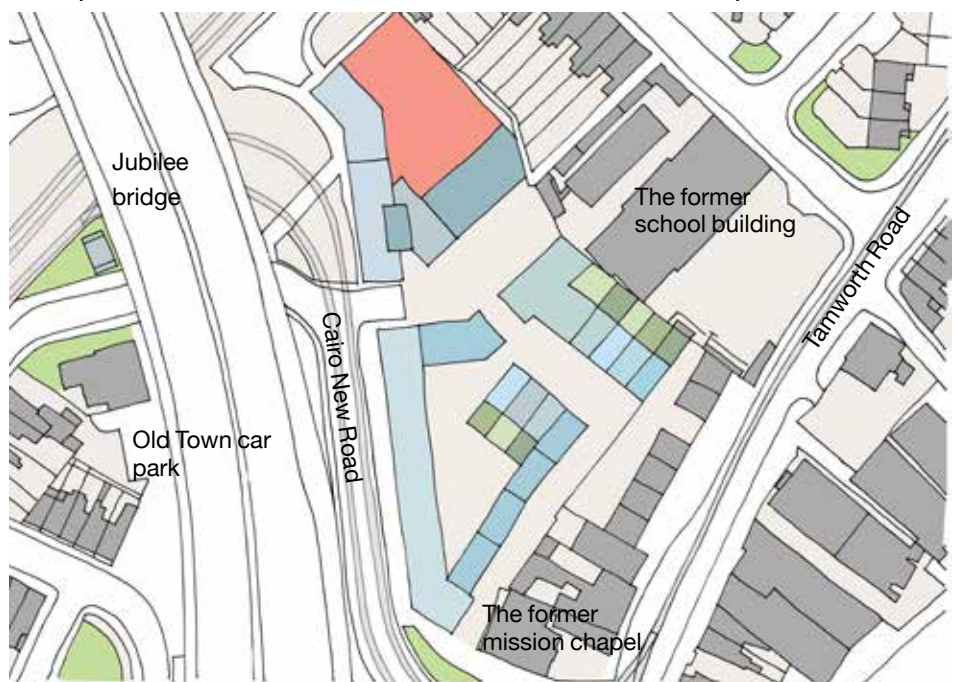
Indicative sketch of Cairo New Road. The red on the plan indicates a possible location for the existing church on the site and the blue highlights new residential development. The green represents green space. All other buildings are existing.
